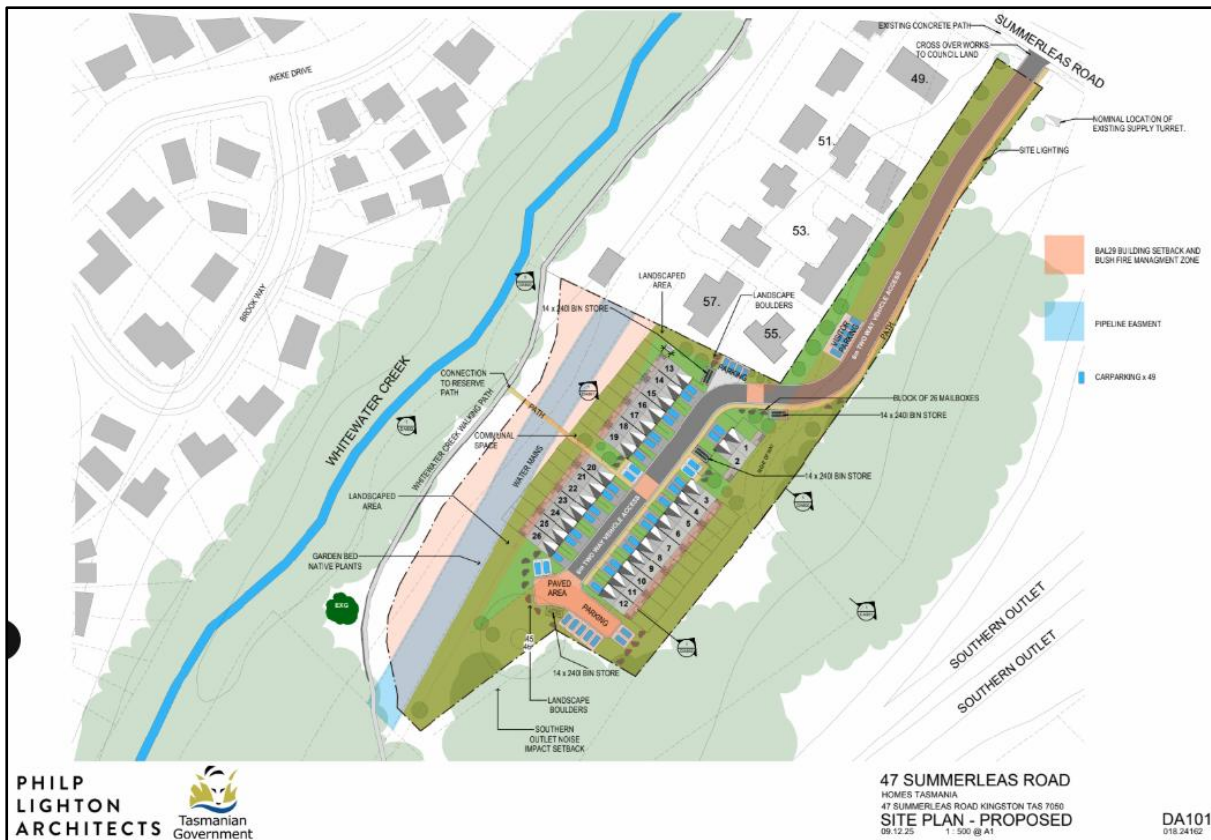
Plan of site. Plans provided by Philp Lighton Architects.
